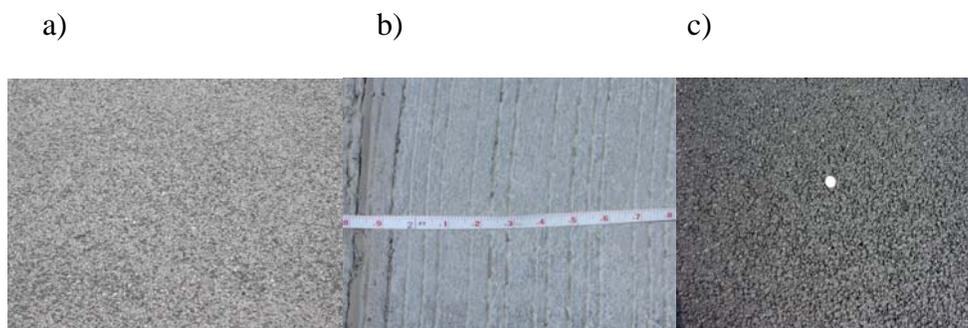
Tested pavements: a) densely graded asphalt (DGA), b) transversely grooved concrete and c) porous friction course asphalt (PFC).
